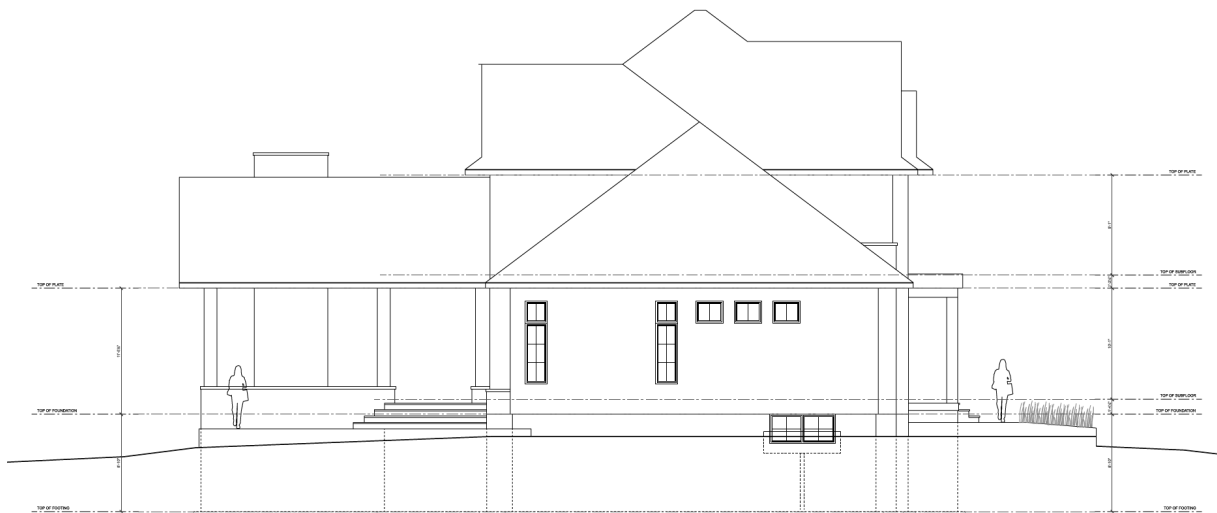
2D Left Elevation of Proposed Building (Source: Ardington & Associates)
